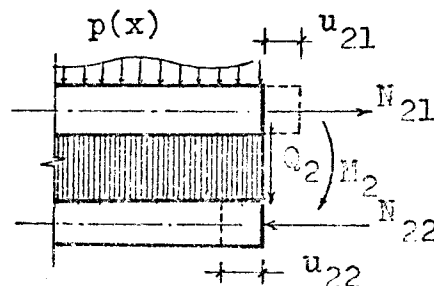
STRAINS IN CORE AND EXTERNAL APPLIED LOADS ON SHEAR WALL.
